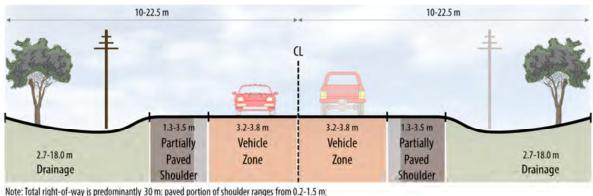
Belfountain Village Existing Cross Section (Old Main Street and Bush Street)
